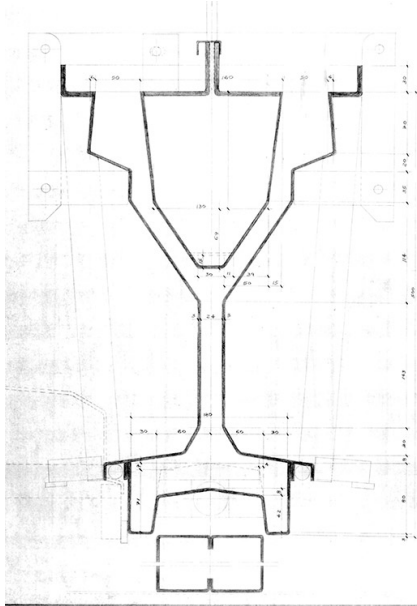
Detail of the metal mould for the school's roof or 'floor beam'. Section. Drawings originally scaled 1:1.
